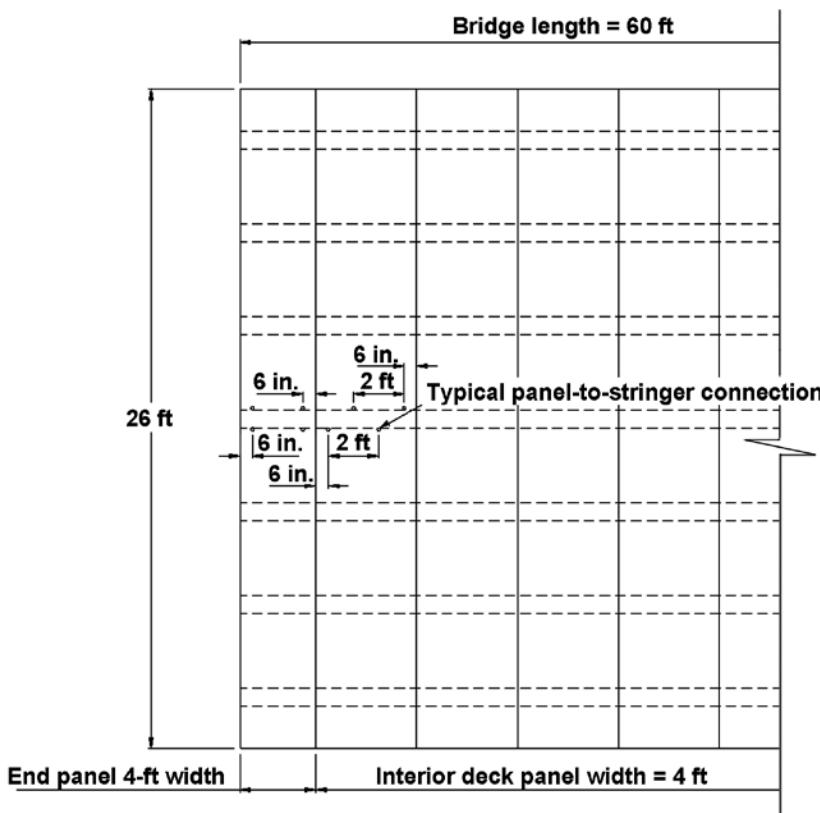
Plan view of baseline bridge, showing the transverse glulam deck panel layout for a 60-ft-long bridge.
